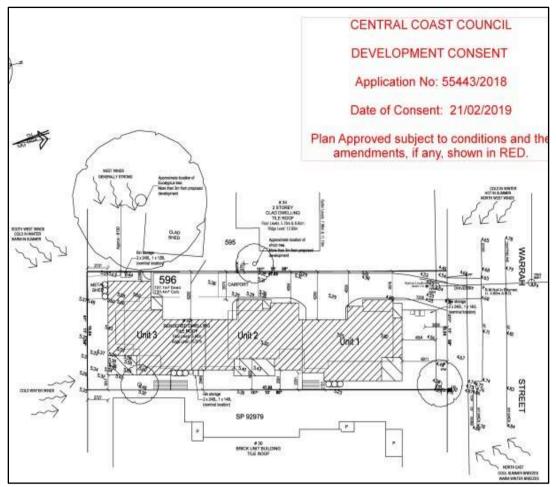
Excerpt of approved site plan – 32 Warrah St, Ettalong Beach KM Feb 2023
